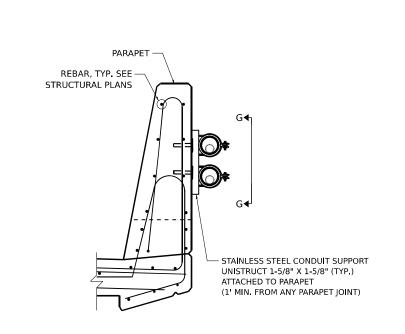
WB OVER GARDNER ST BRIDGE PARAPET CROSS SECTION
